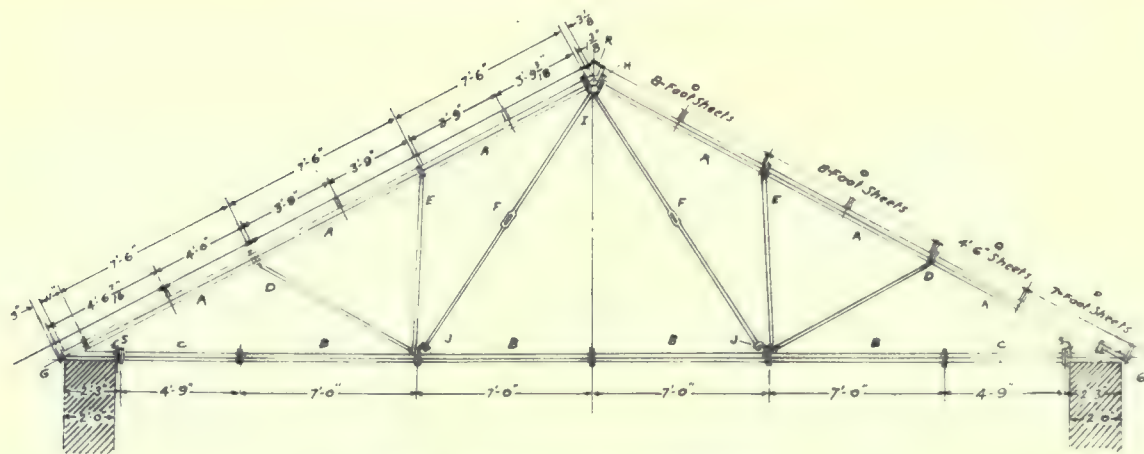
DETAILS OF ROOF CONSTRUCTION.
